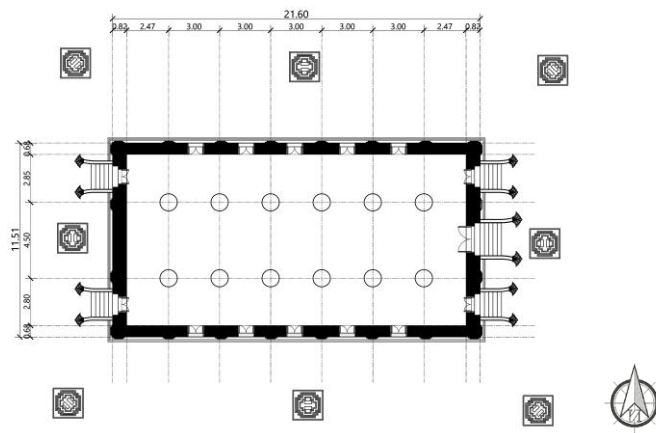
Ground Floor Plan Ubosot Wat Bueng Nakhon Ratchasima
